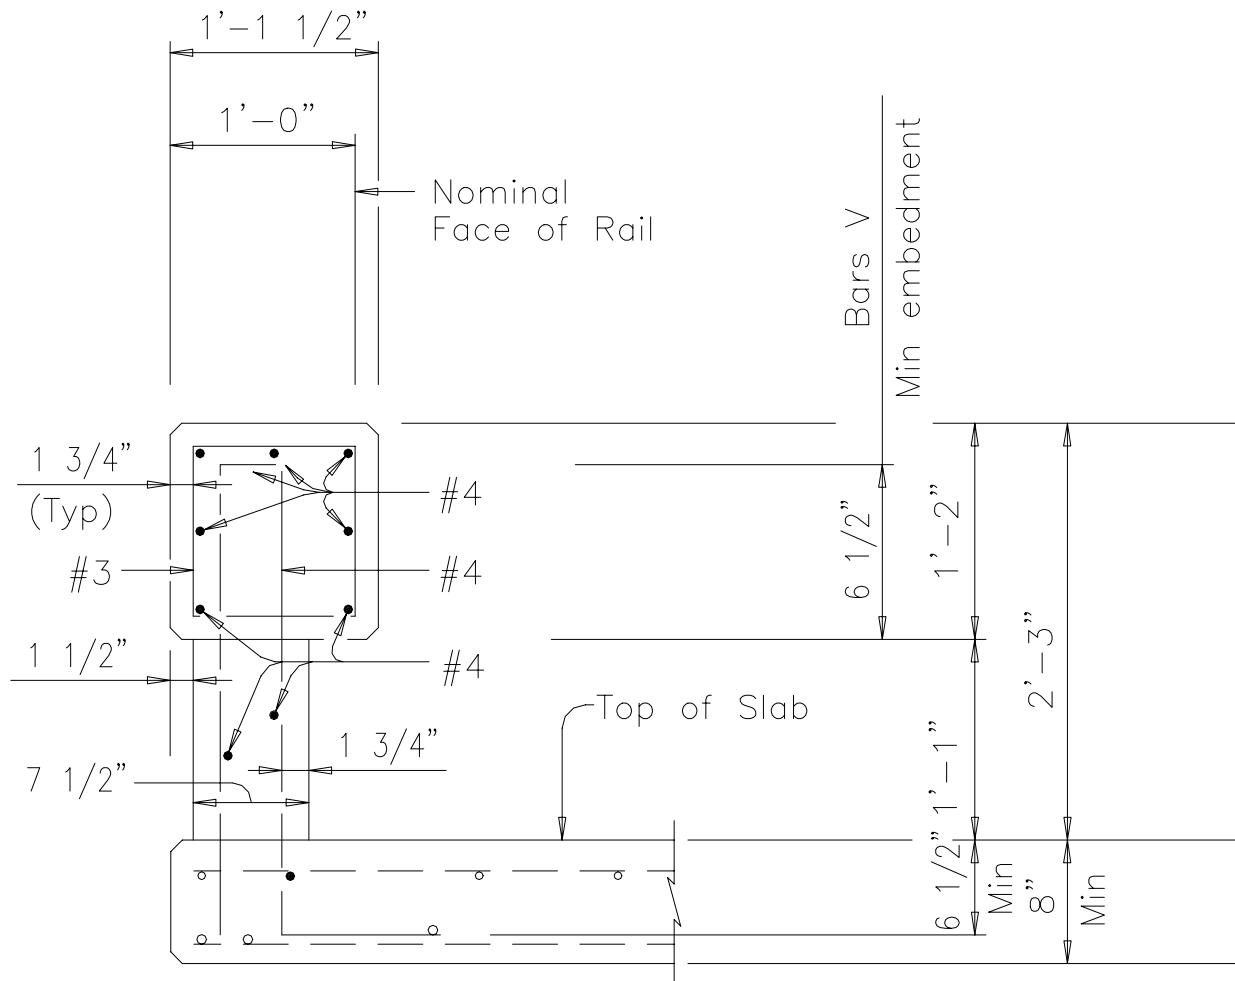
T202 (MOD) (Now T203) Bridge Rail Cross Section.
